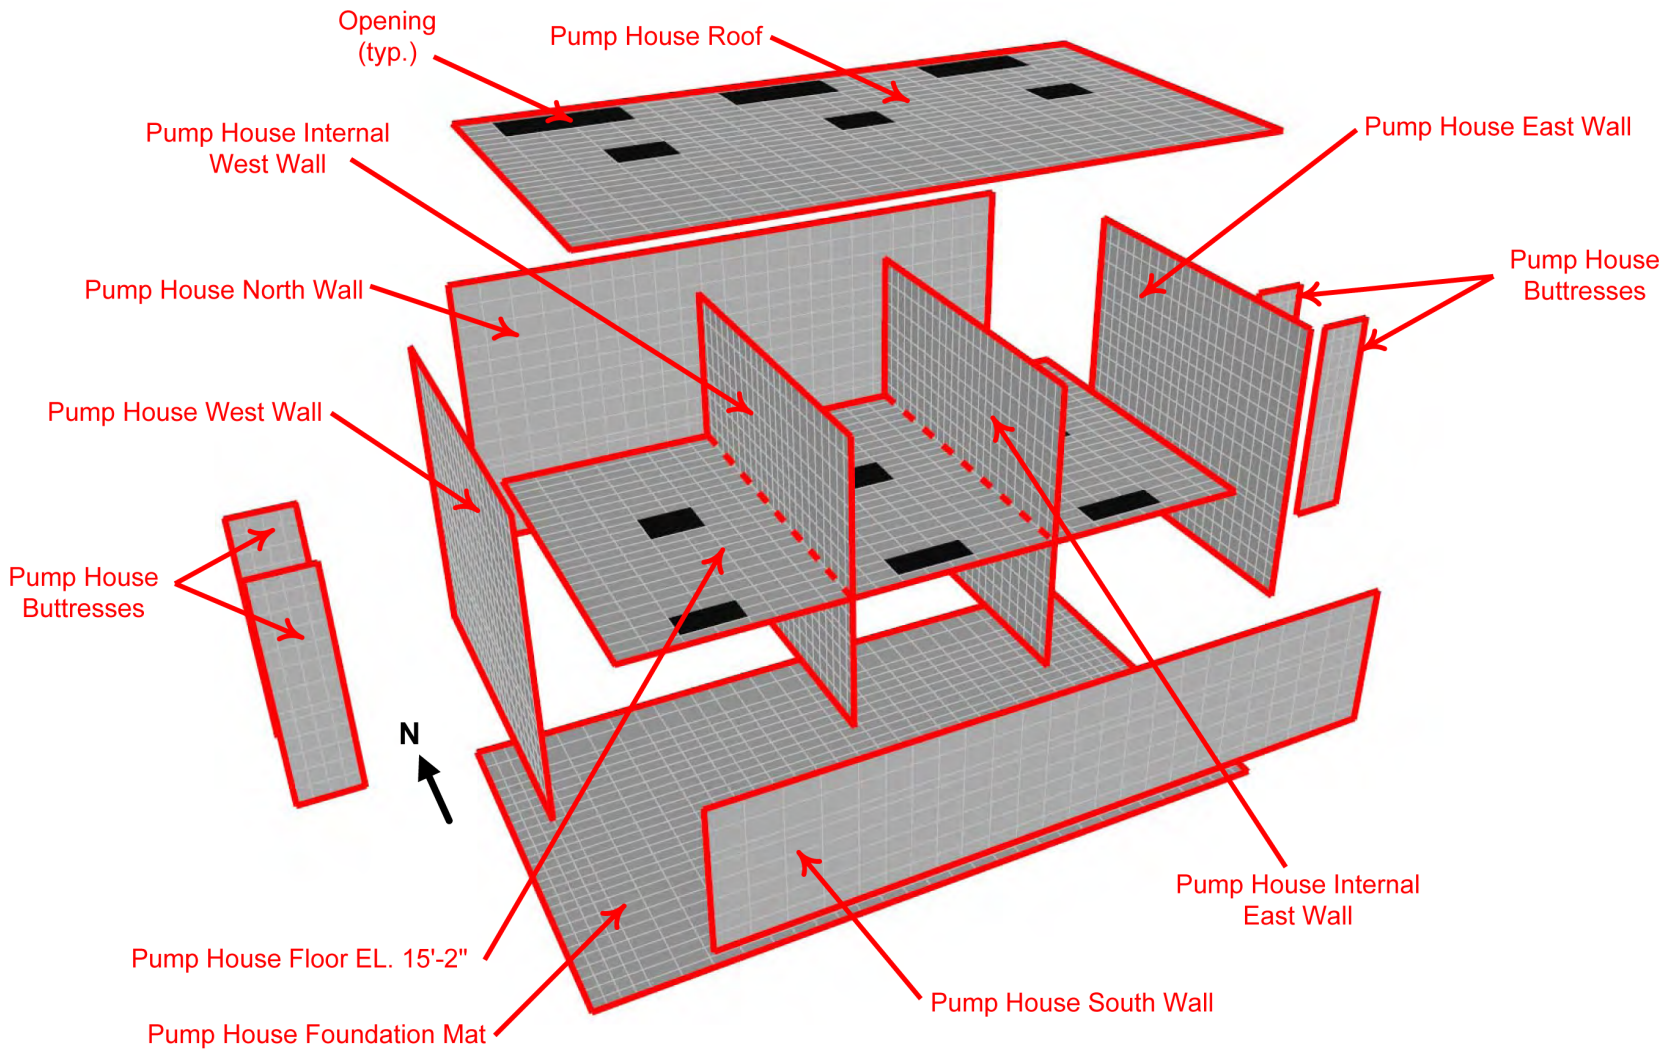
H.6-40A RSW Pump House Wall and Slab Labeling Convention
